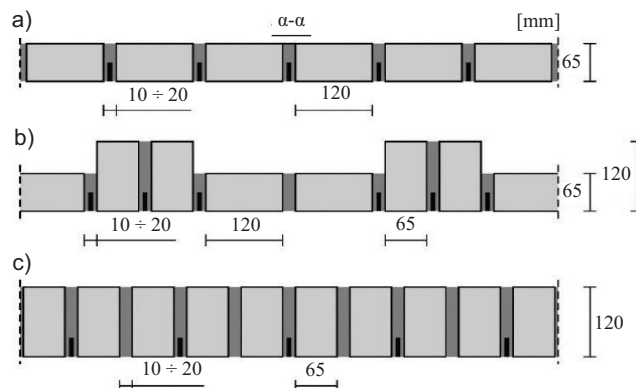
Ceramic slab cross-section: a) lightweight slab; b) semi-heavy slab; c) heavy slab
